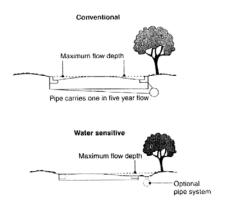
Conventional and WSUD road cross section (Source: Engineers Australia 2006)
